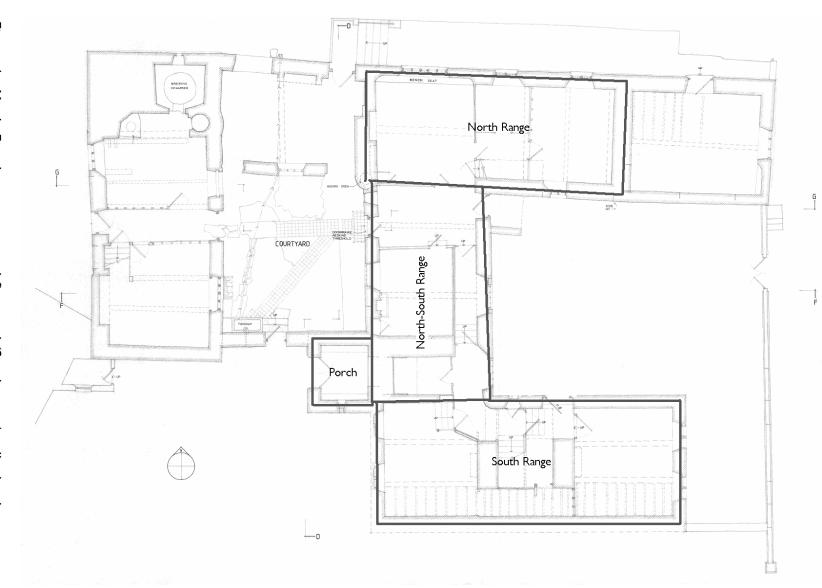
Yarde Farmhouse, at ground-flounder investigation outlined (Architecton) Yarde Farmhouse, at ground-floor and (South range) cellar level, areas
